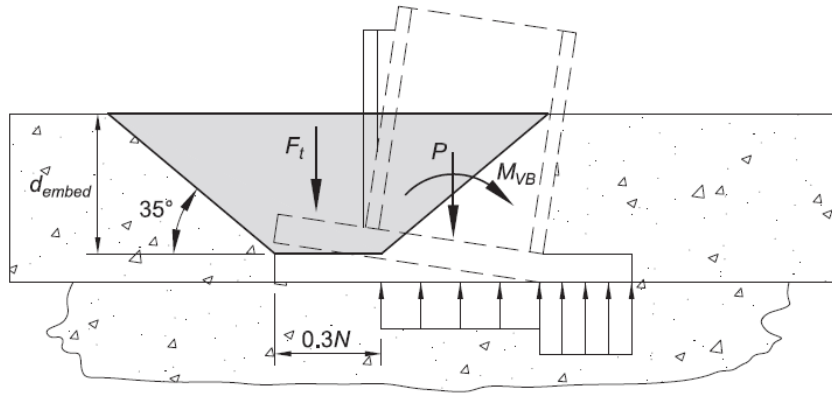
Concrete breakout force above the tension side of the connection in the absence of horizontal reinforcement.
